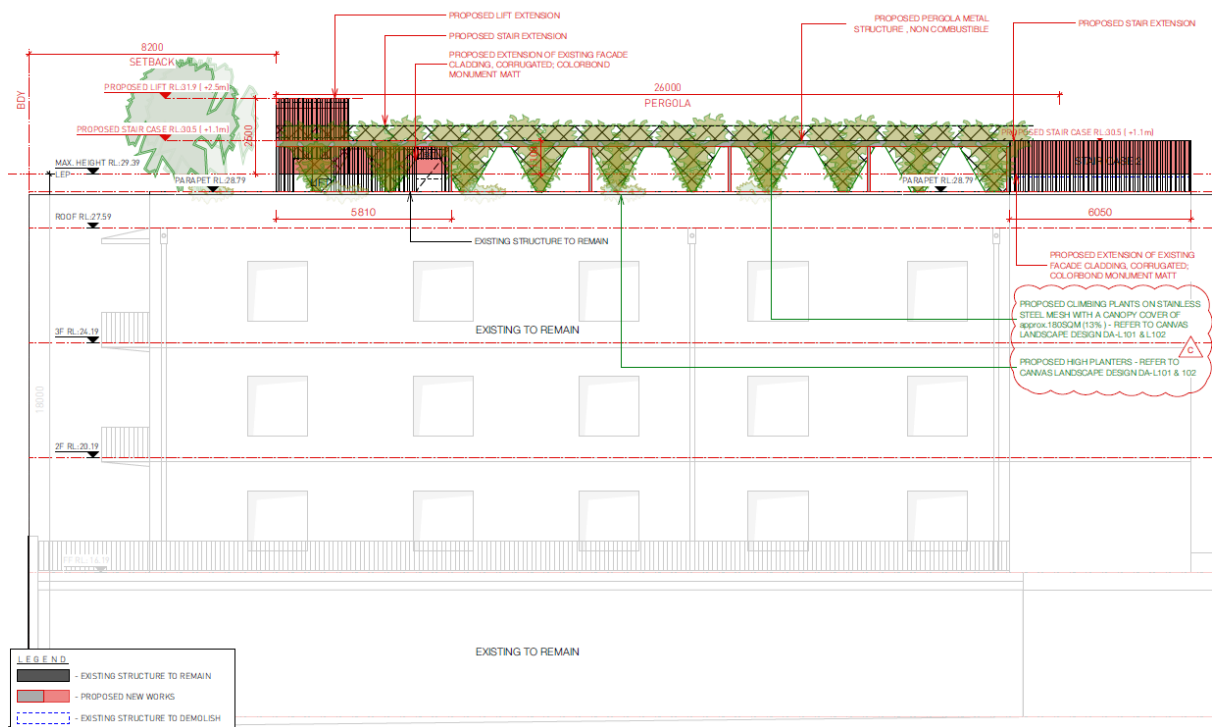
Proposed West Elevation Plan demonstrating the proposed pergola structure and associated landscape screening
